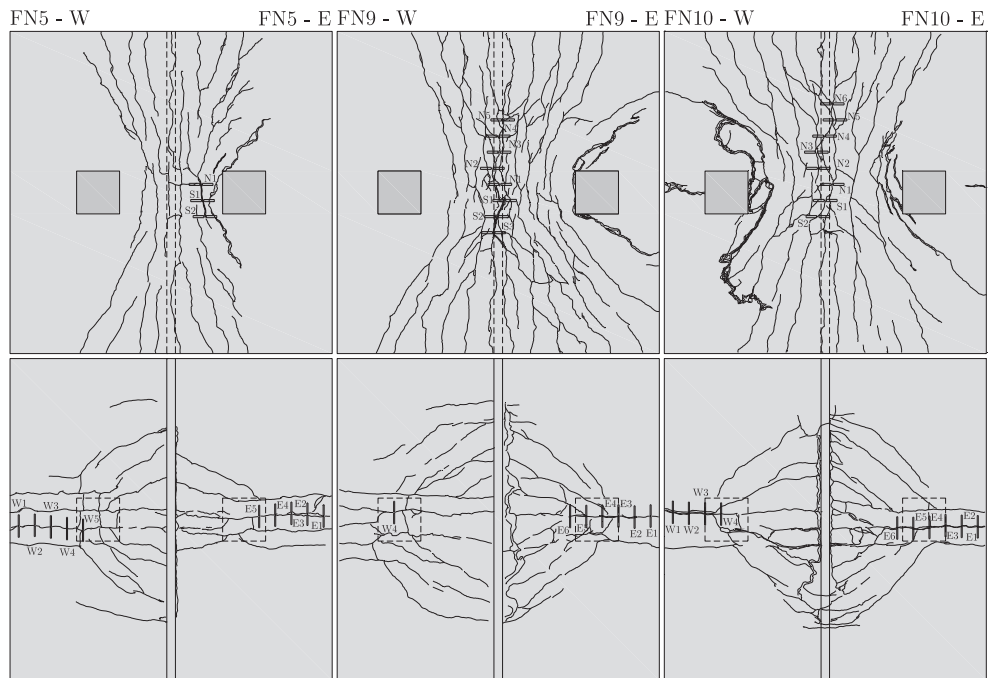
Crack patterns and location of rebar fractures
